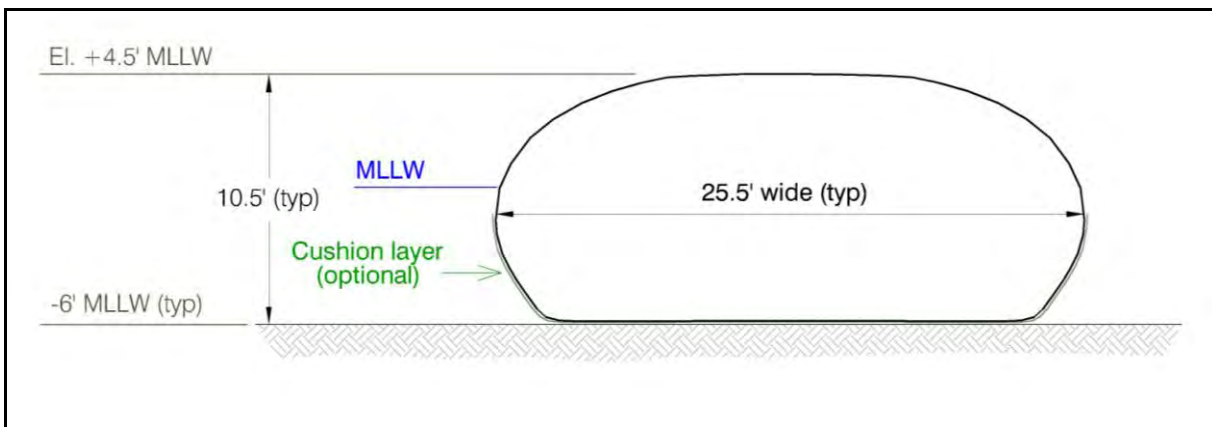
Cross-sectional view of single-tube geotextile groin
